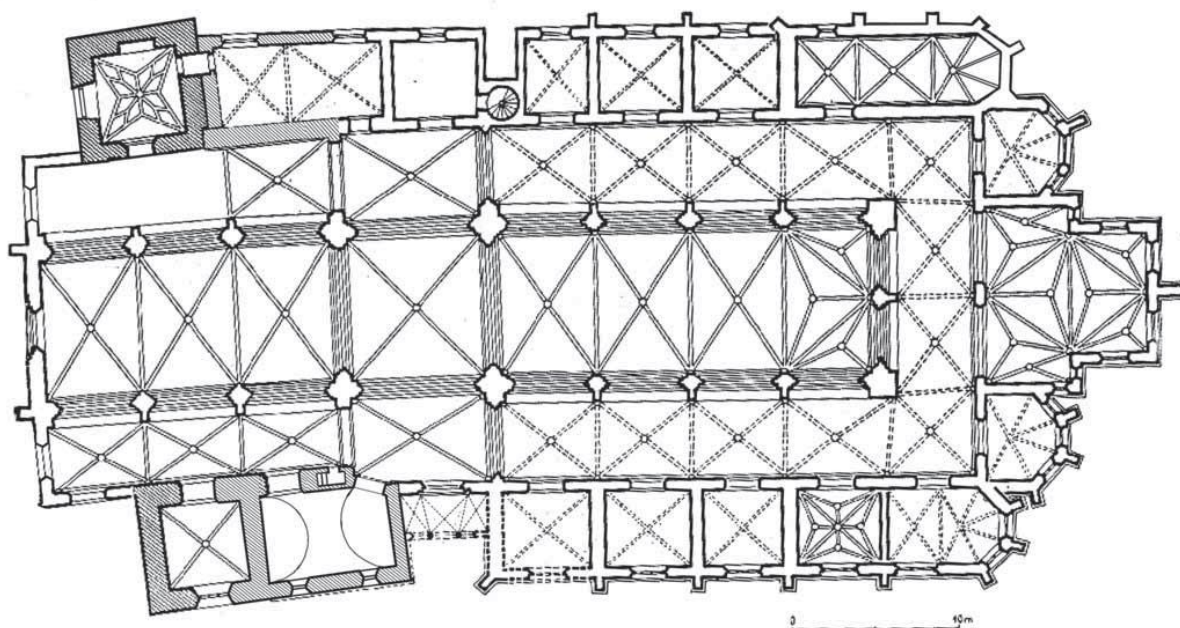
Kraków Cathedral, reconstruction plan of the church in 1364
